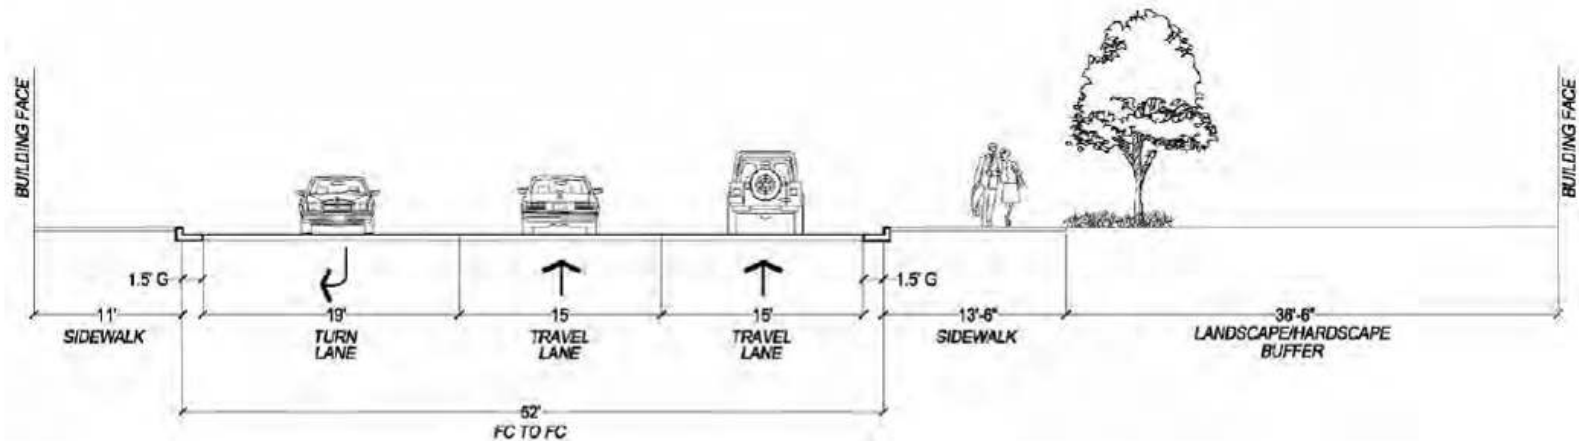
Existing cross-section of 12th Street S. looking west between Crystal Drive and S. Clark/Bell Street
